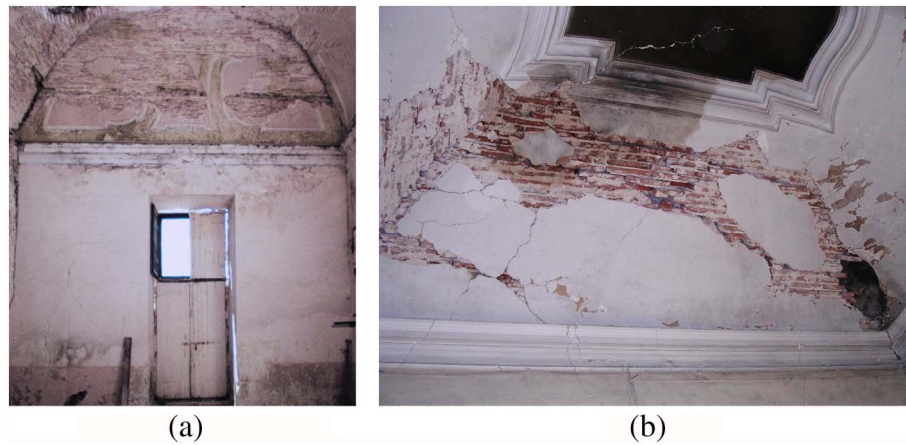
Damage mechanism of two pavilion vaults caused by walls overturning.
